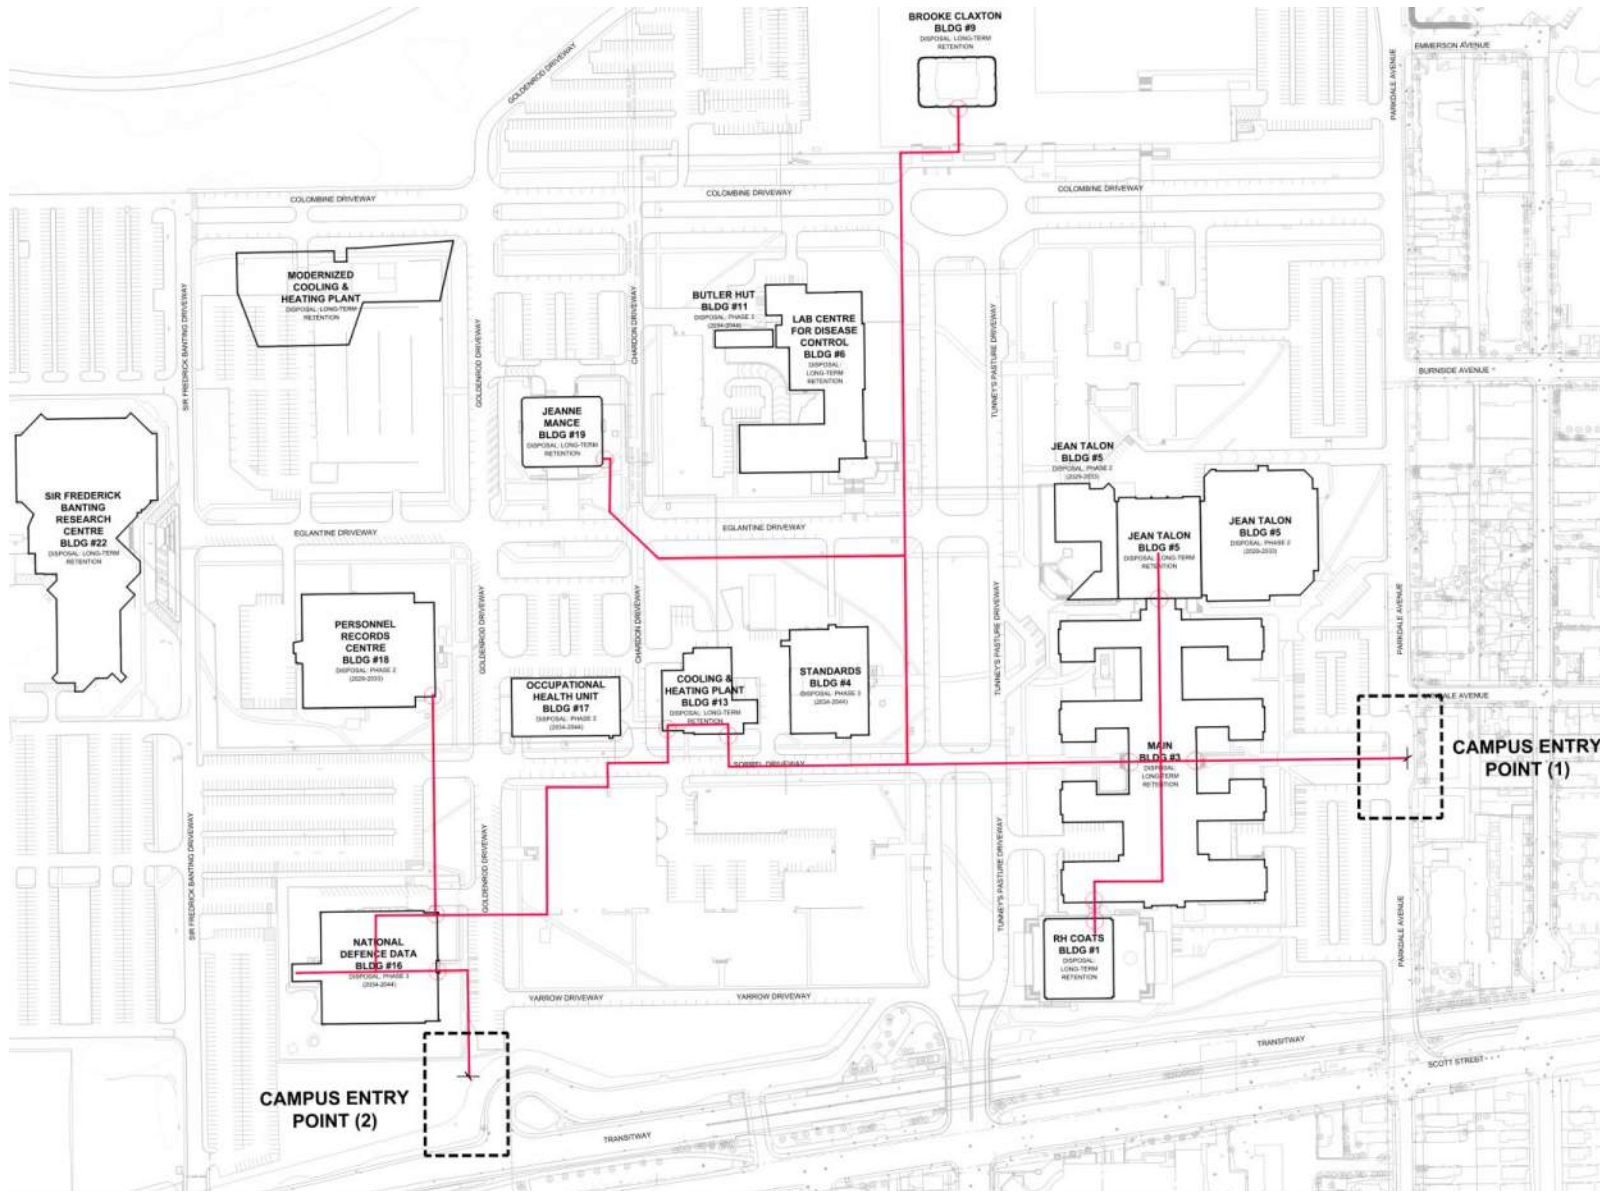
Carrier Drawings – Zayo Group (Red Fibre) (Attain Drawing Page #6)
